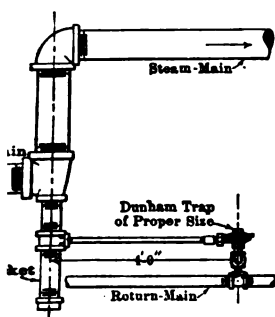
Detail Showing Method of Draining Bottom of Steam-riser in an Overhead System
